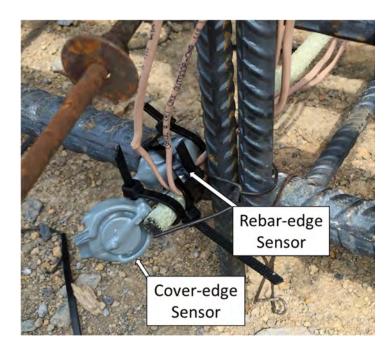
Example of cover-edge and rebar-edge sensors in Harpersville crashwall
